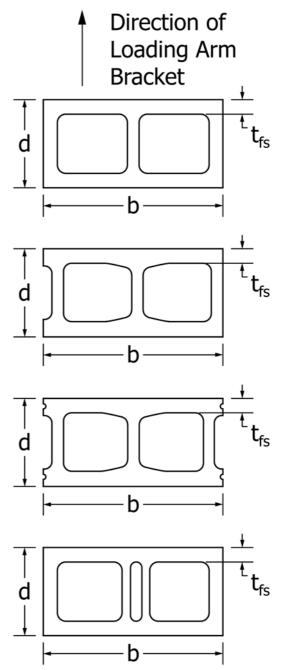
Example Dimensions of Hollow Masonry Units Used to Determine Section Properties
